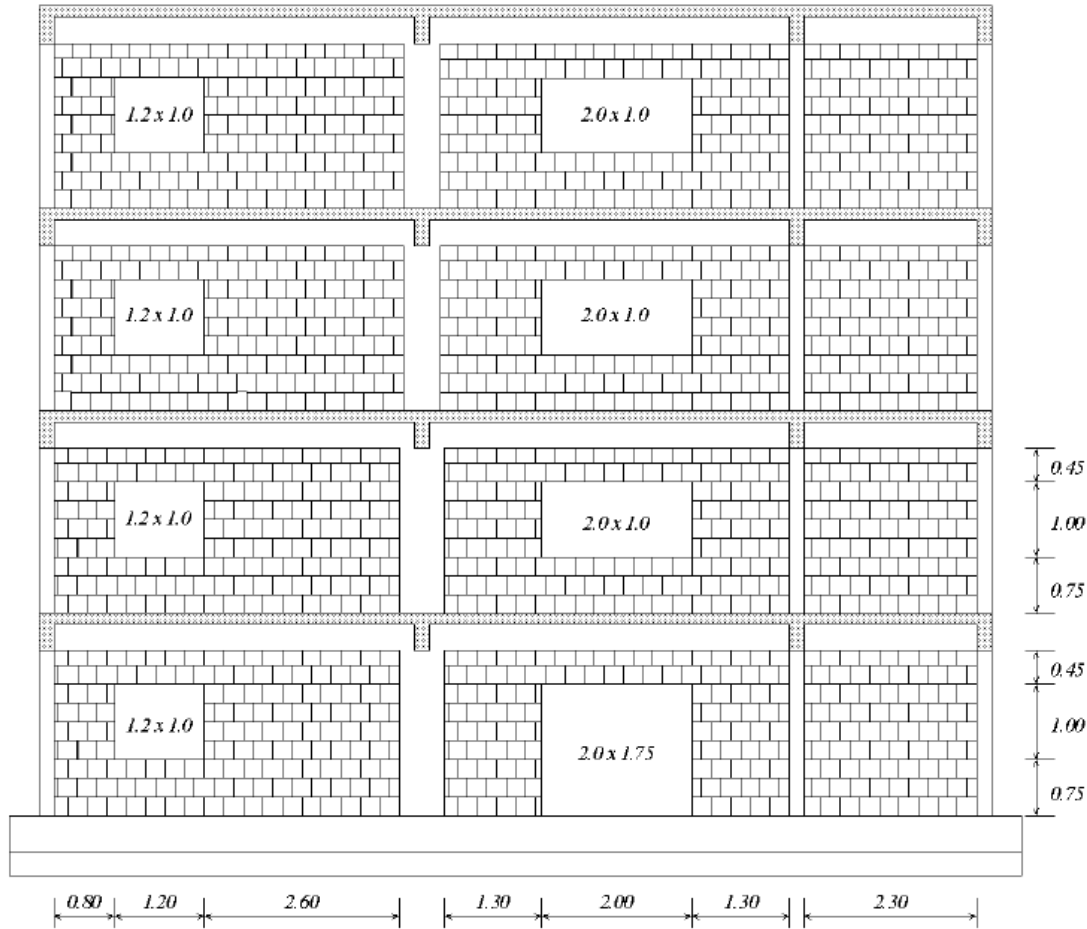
Elevation view of the infilled frame-Location and dimensions of openings [42].
